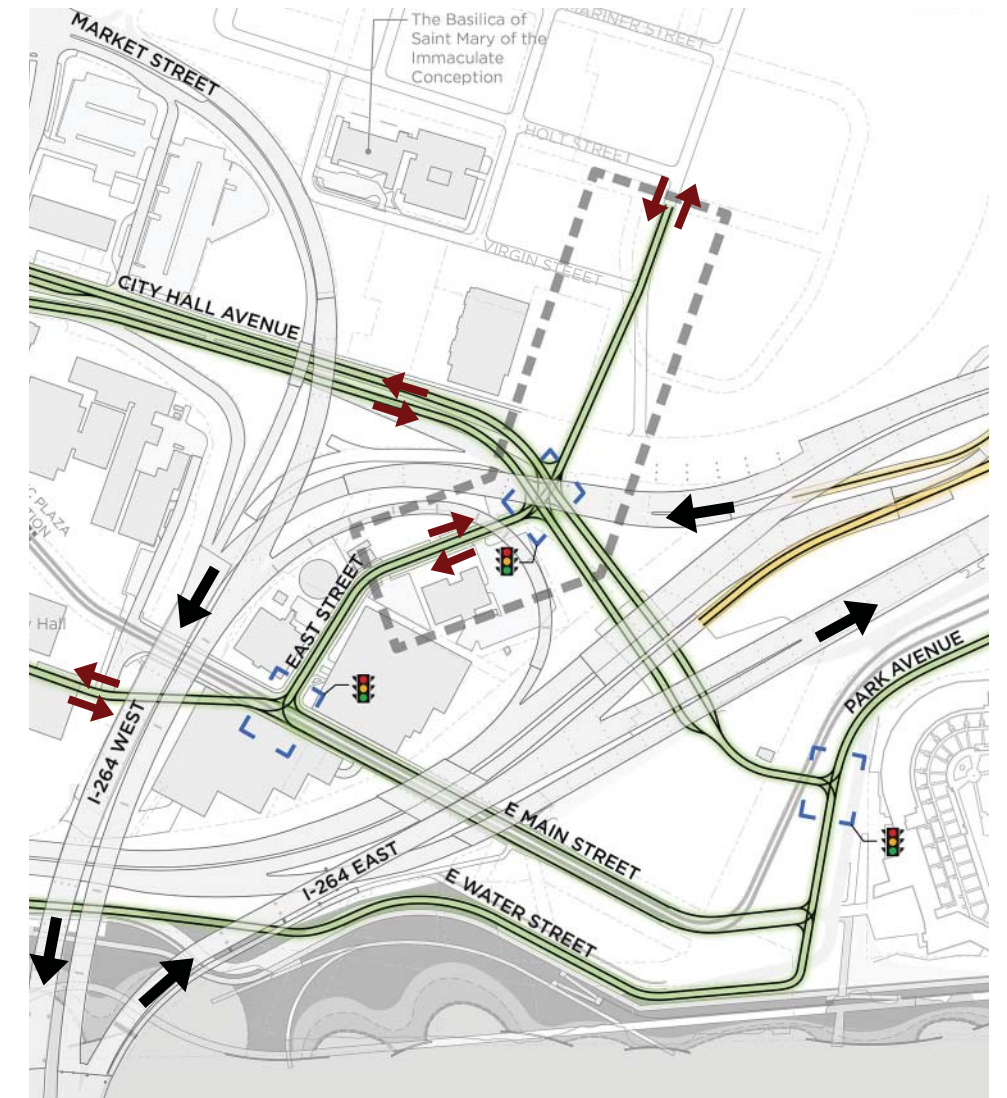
Alternative B East Street extension to St. Paul's Area.
